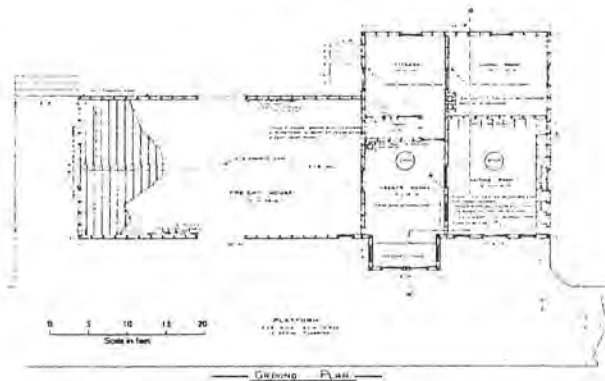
The Grand Trunk Pacific's Type D station plan 100-54.<sup>13</sup>
